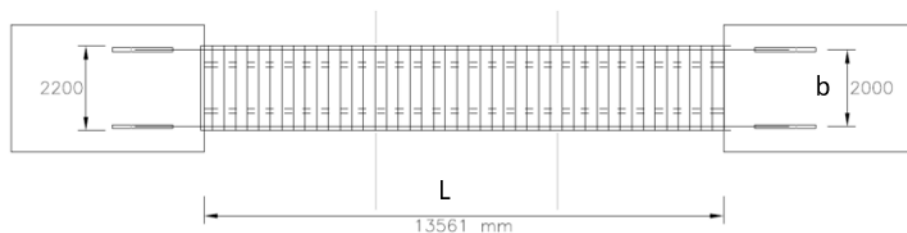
Plan view of the Glass Truss Bridge [27]
